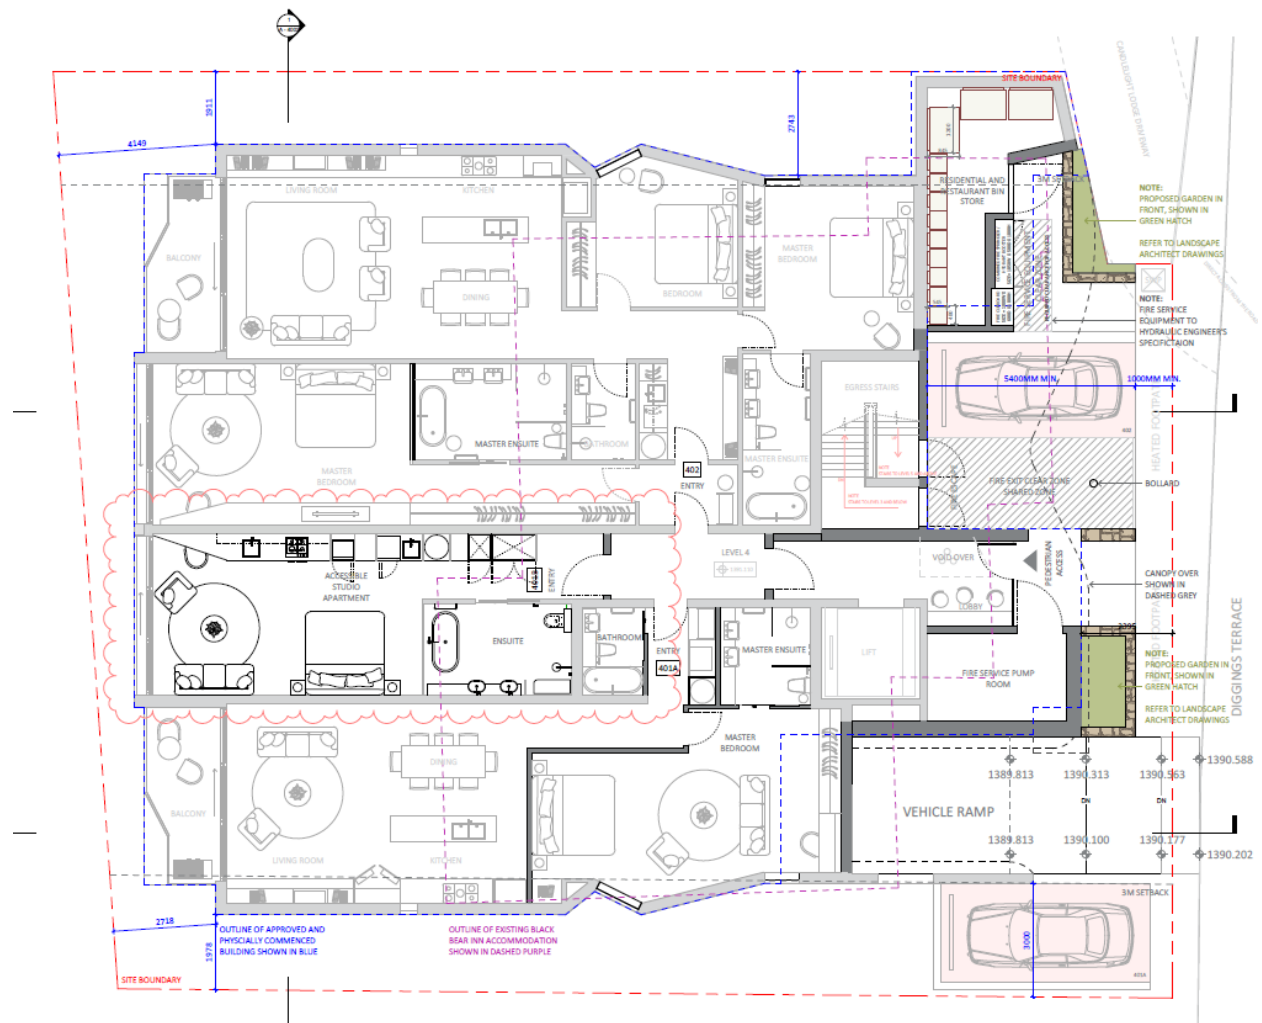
| Proposed landscaping shown in green (Source: Applicant's documentation)
